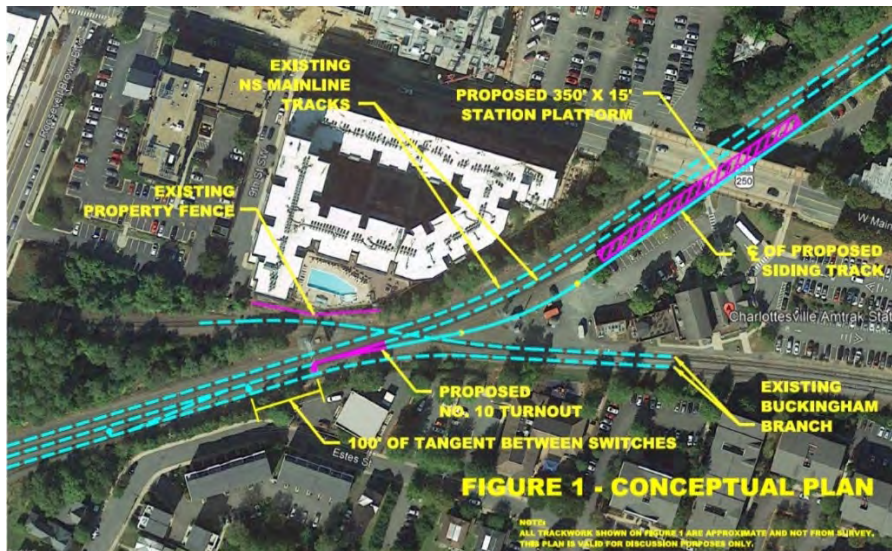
Special Siding Conceptual Plan - Aerial (Jacobs, March 2020)
